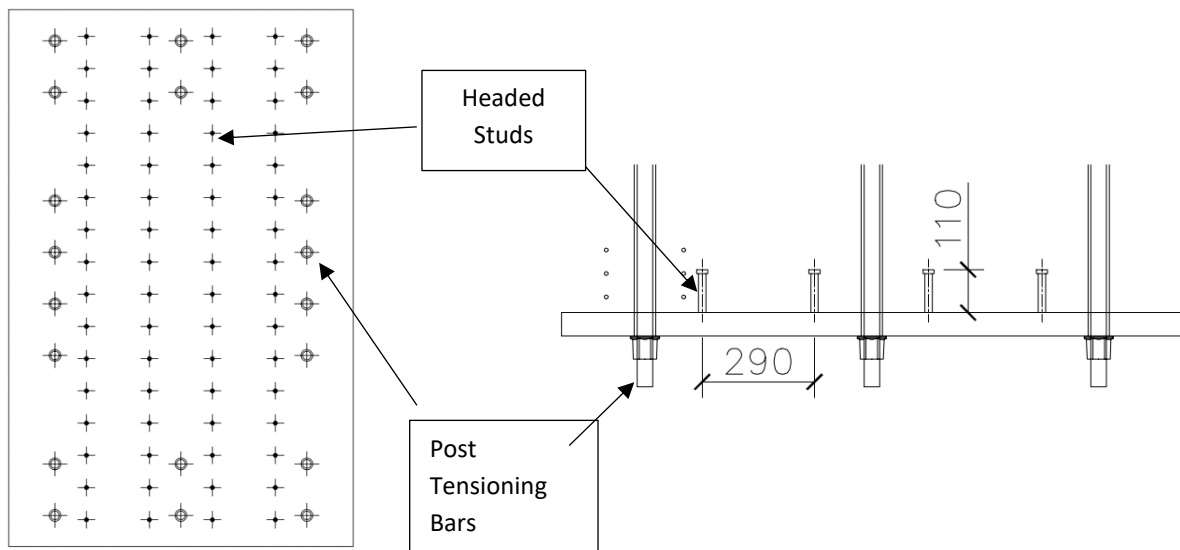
Example of headed studs welded to the base plate (left: front view; right: side view).
